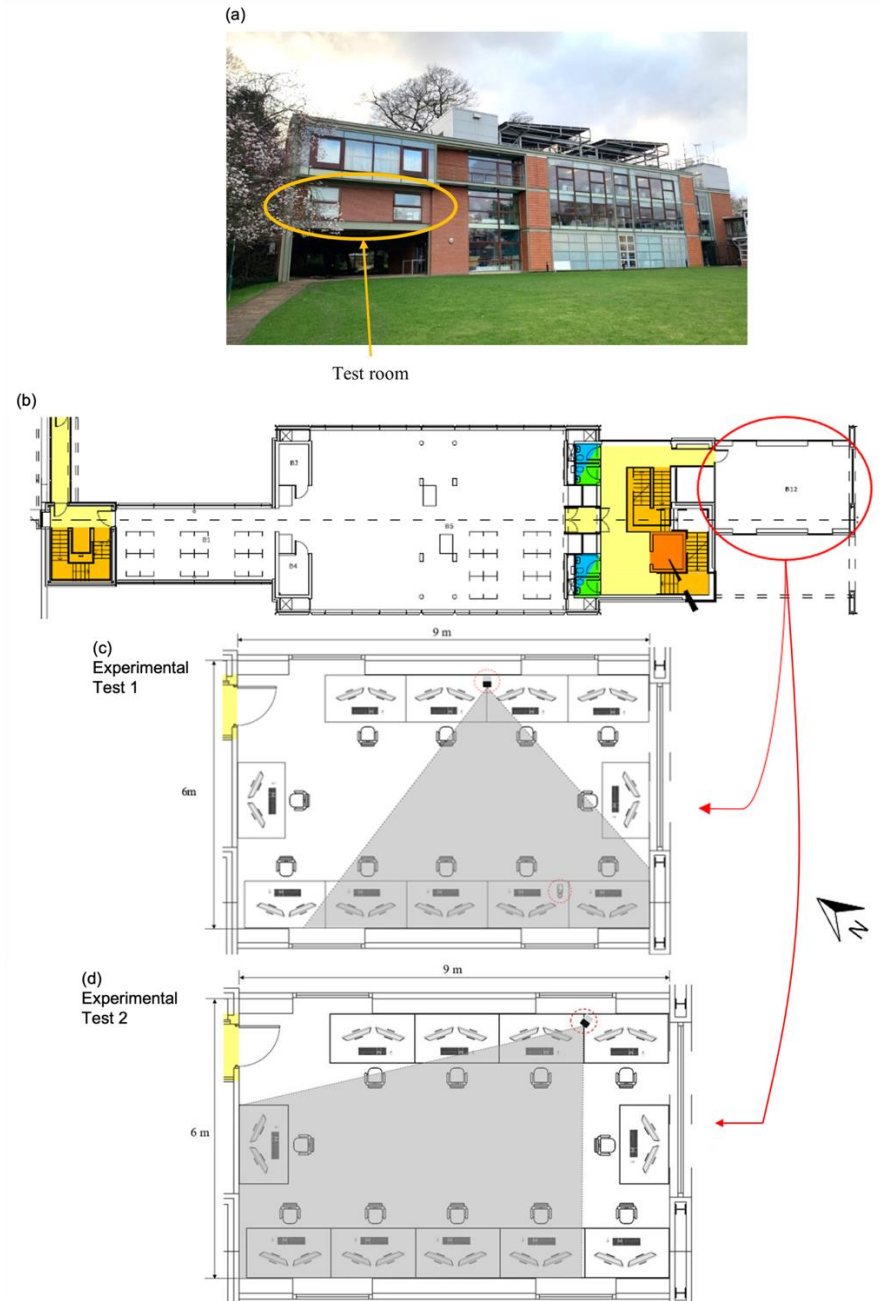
(a). Sustainable Research Building at the University of Nottingham, UK. (b). Floor plan of the first floor of the building with (c). Set up for the Experimental Tests 1 and 2 in (d).
